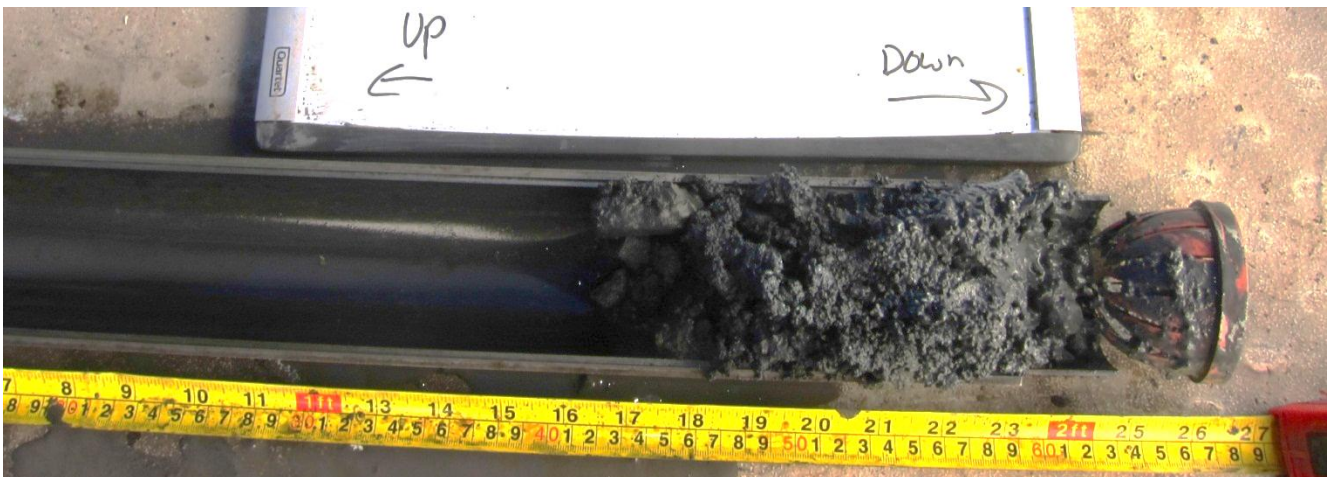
KC12-OVB49 LPT 12 of 13 (12.46 m – 12.76 m)
